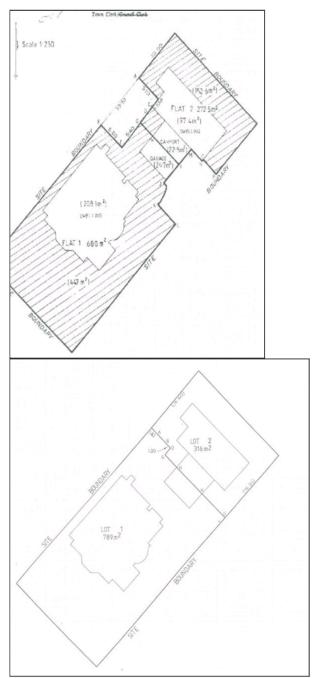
the original (left) and the amended (right) strata plan for 409 Argyle Street.
